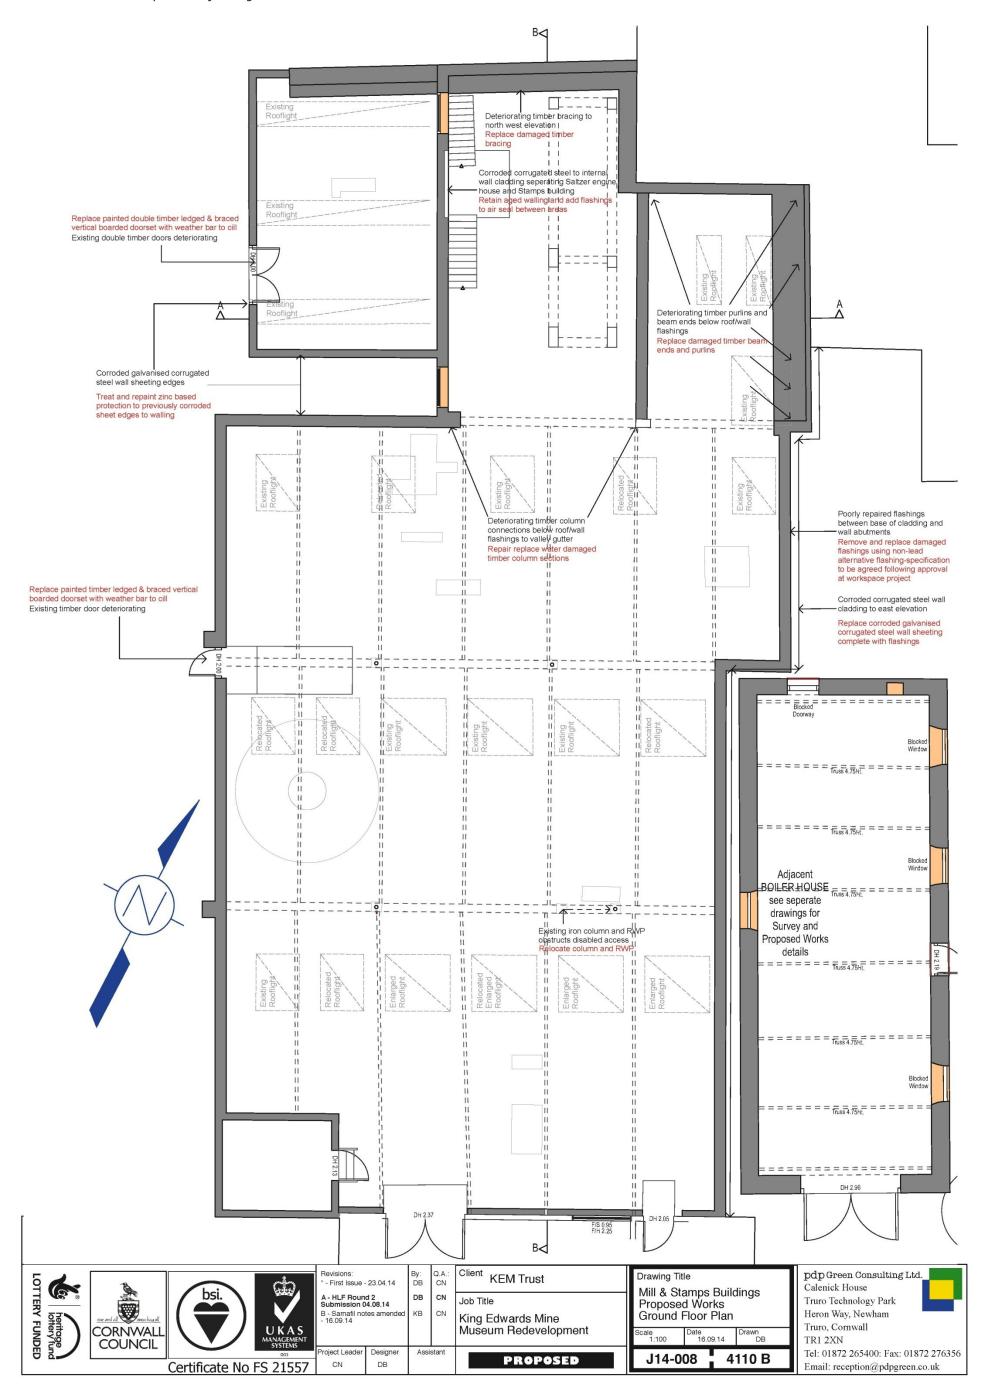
Ground floor plan of the Mill and Stamps proposed works (PdP Green Cons. Ltd Dwg No. 4110B)
